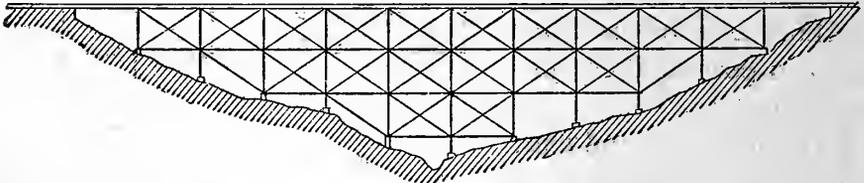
SKELETON ELEVATION OF TRESTLE.
